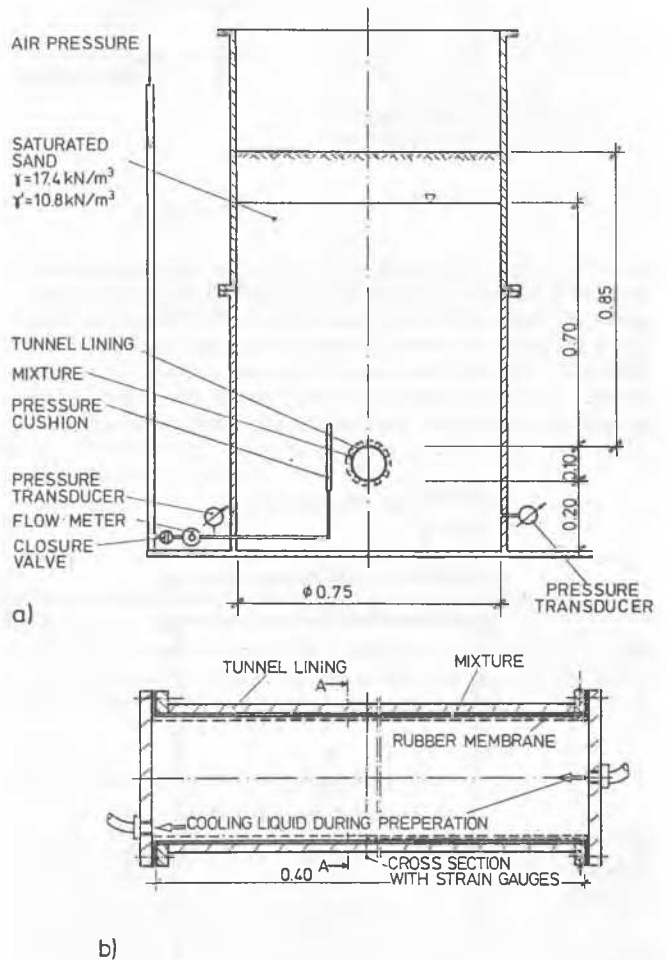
Cross section of the strong box with tunnel model (a) and cross section of the tunnel model (b)
